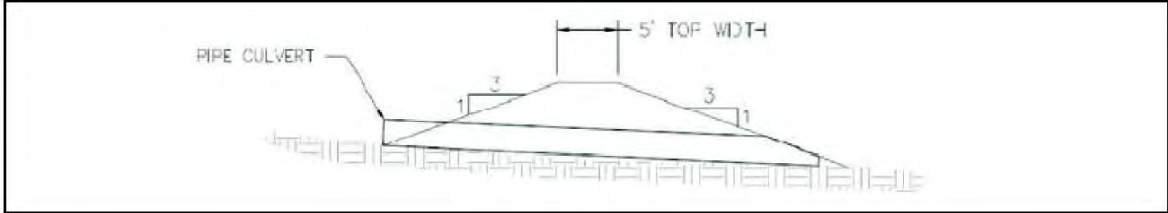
Large Dry Dam Conceptual Plan – 100-year Storage.
